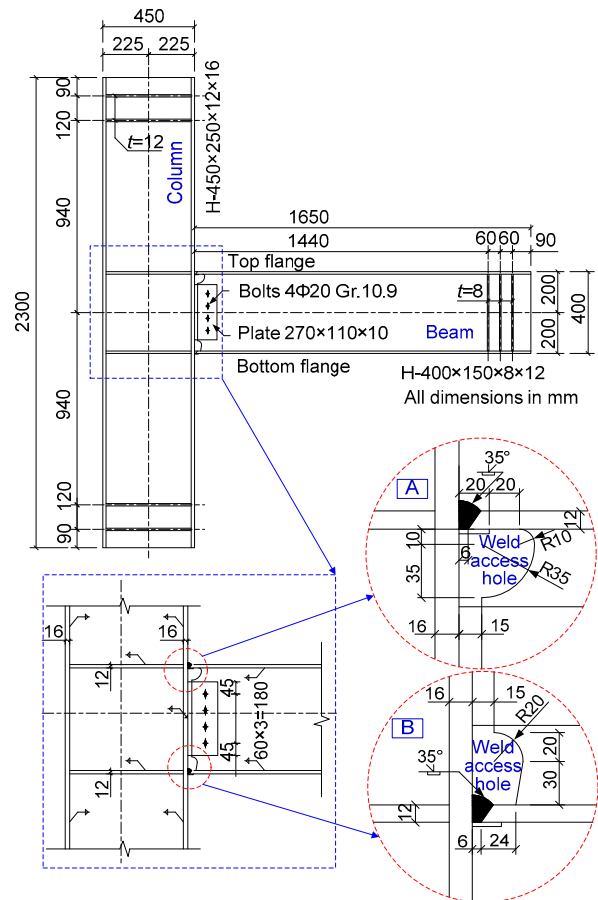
Geometries and weld details of the beam-to-column connection specimen (unit: mm)
